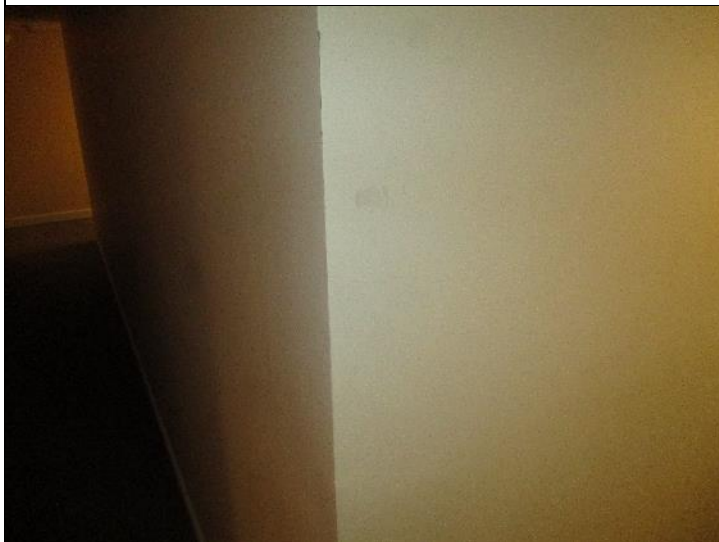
Minor deterioration noted to the painted wall finish. Overall, the hallways were in good condition during our review.
